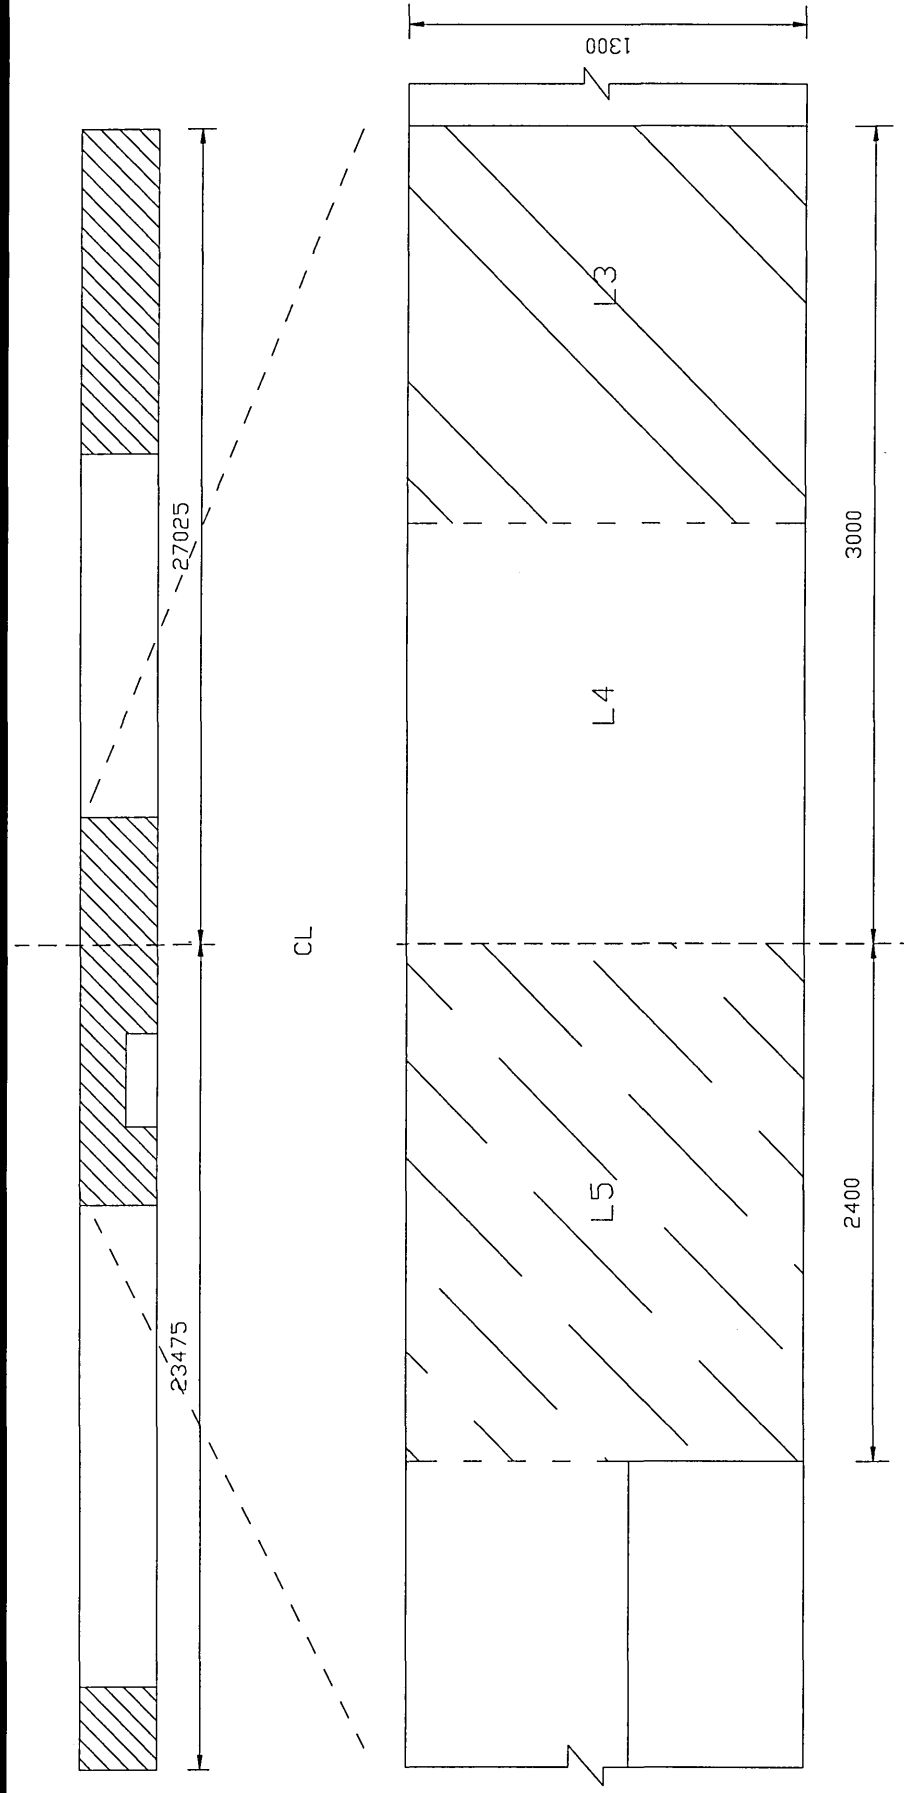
Location of instrumented materials on north abutment at Lawns Lane Bridge
